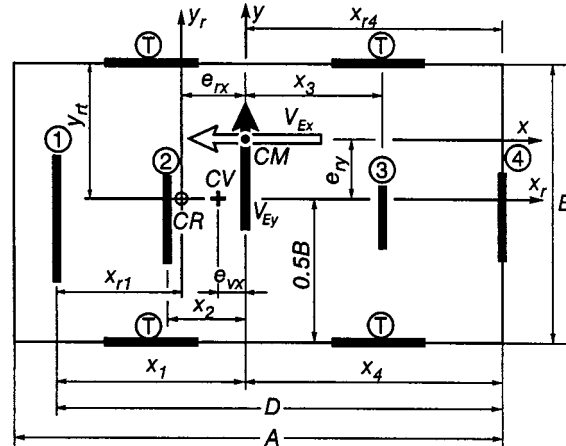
Typical arrangement of elements resisting lateral forces generated by system translation and twist
